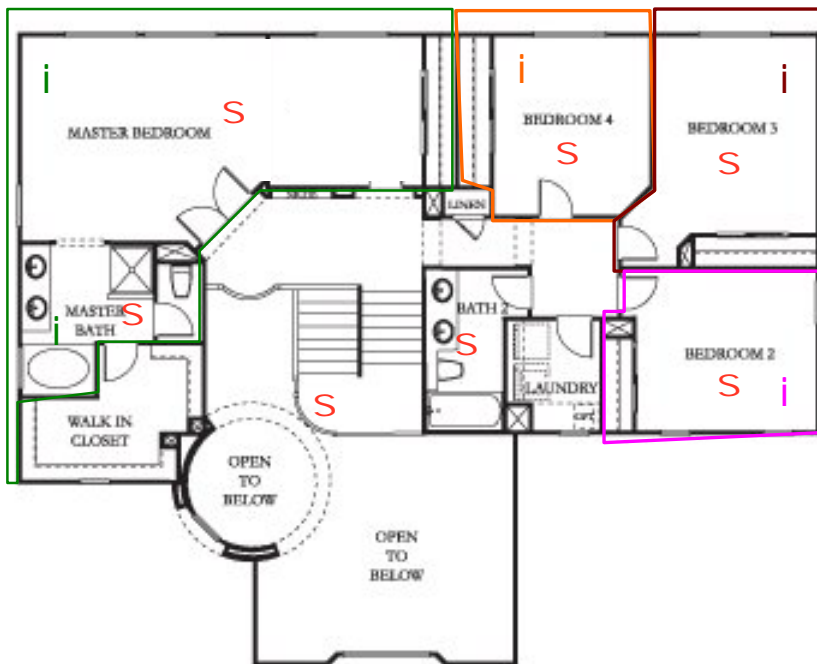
Second floor plan for tight house showing injection (i) and sampling (s) locations.
